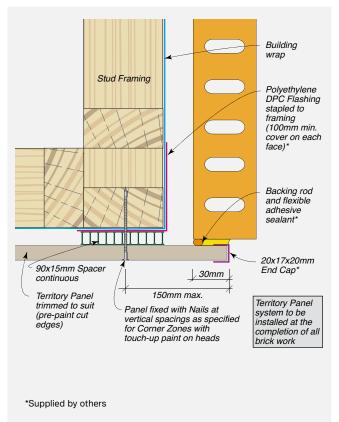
Internal Corner Junction – Panel to Brick Veneer – Plan View
